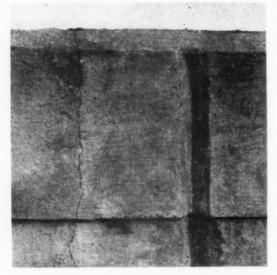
A construction joint occurring only a few inches away from a deliberate dummy joint in a parapet wall.
